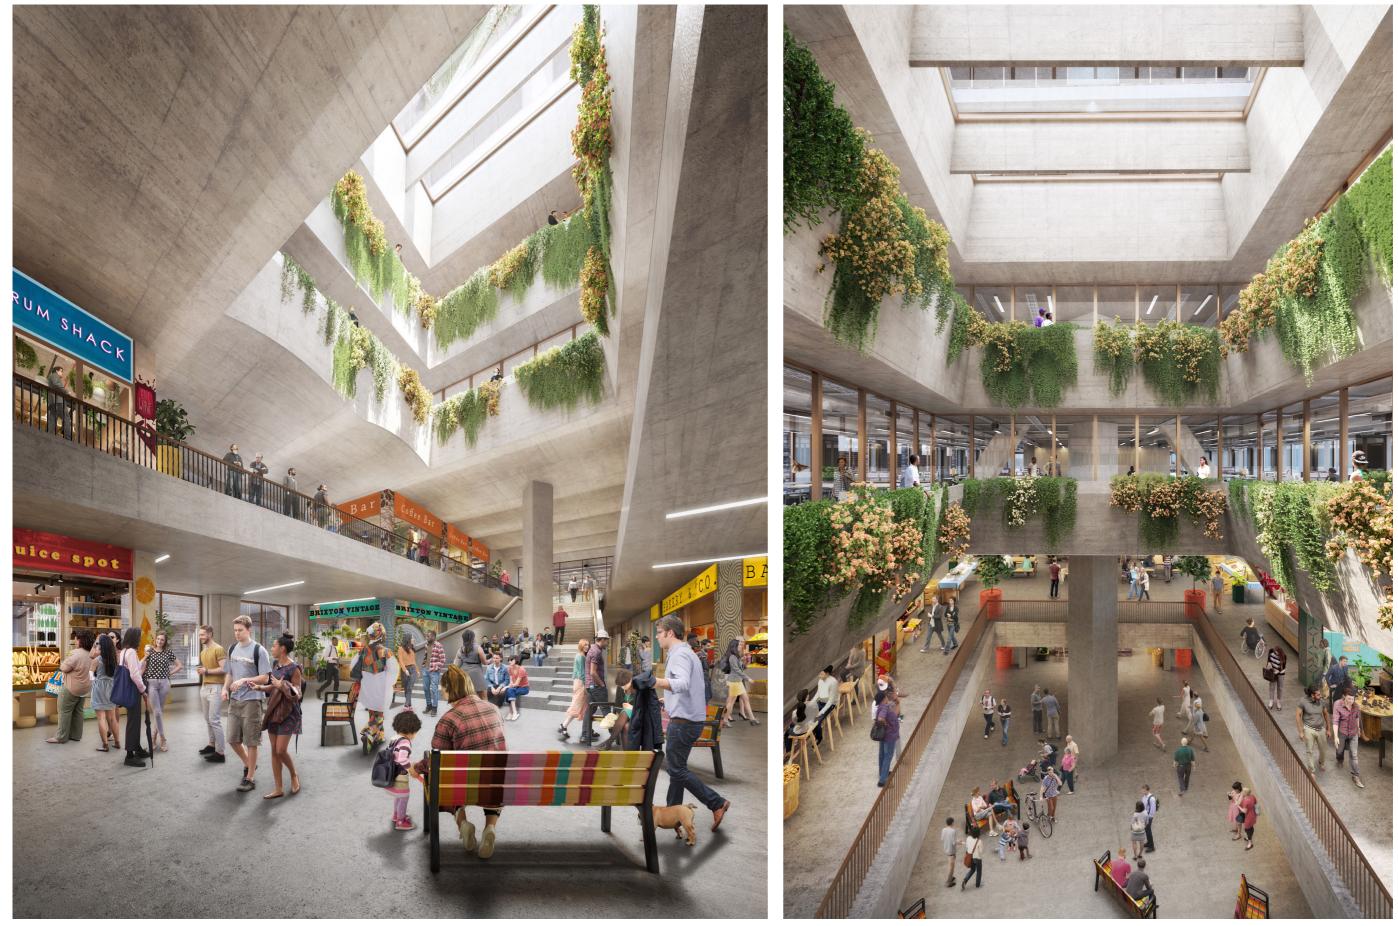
Illustrative view of the Publicly Accessible Open Space from ground floor
